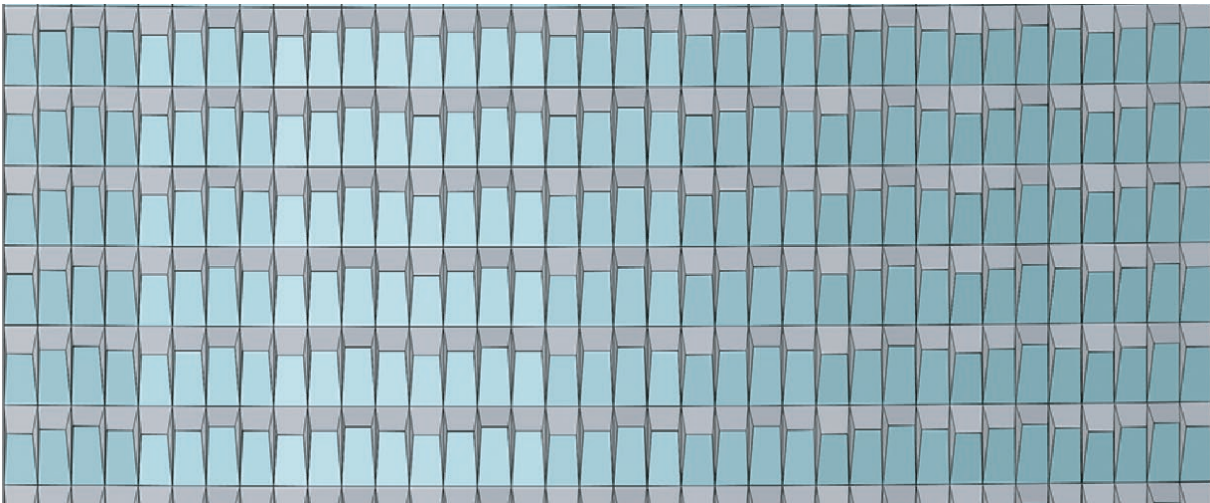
Wave Facade View (S5-1)
